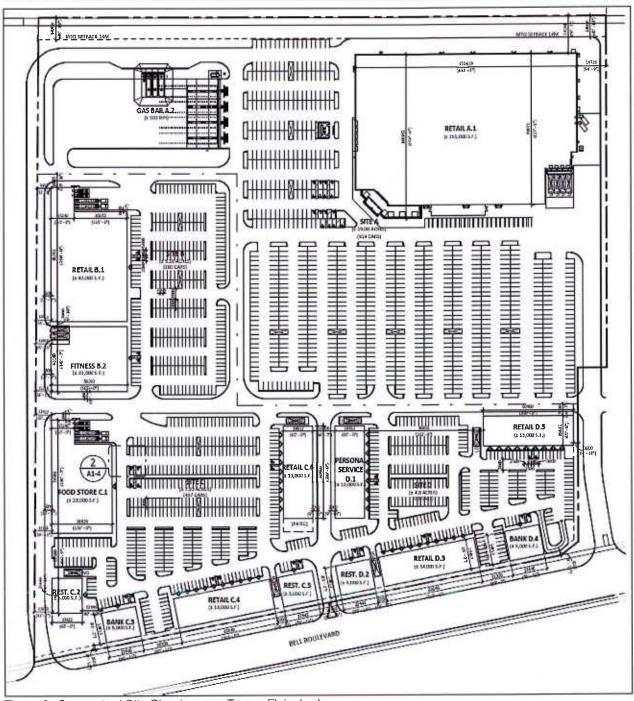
Conceptual Site Plan (source: Turner Fleischer).
